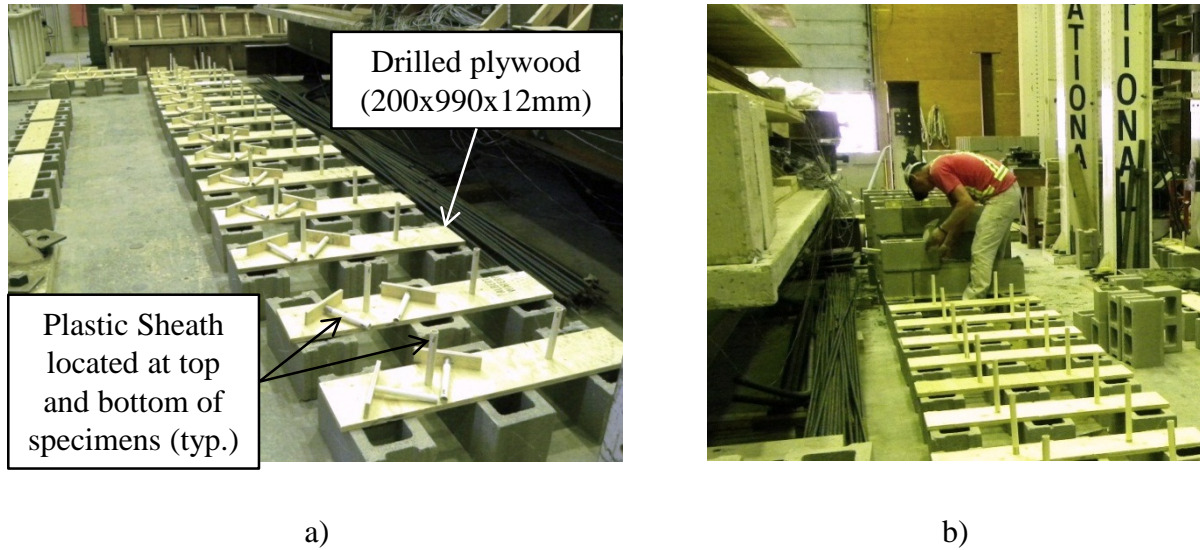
Pullout specimens construction: a) drilled plywood bases and plastic sheaths, and b) block laying.
